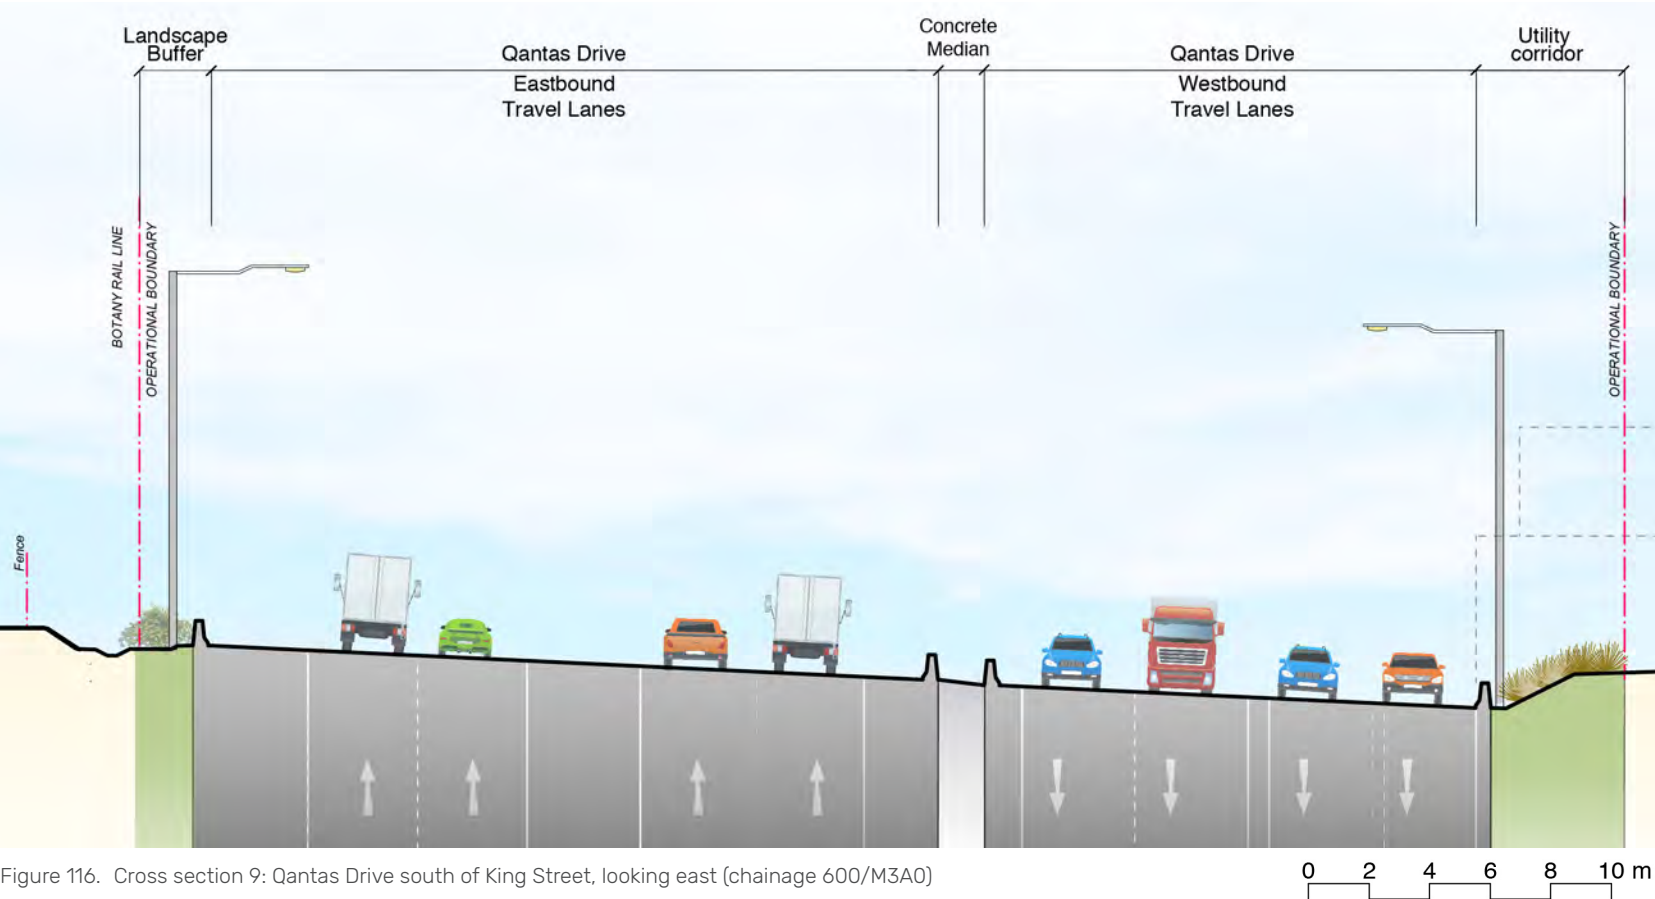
Cross section 9: Qantas Drive south of King Street, looking east (chainage 600/M3A0)
